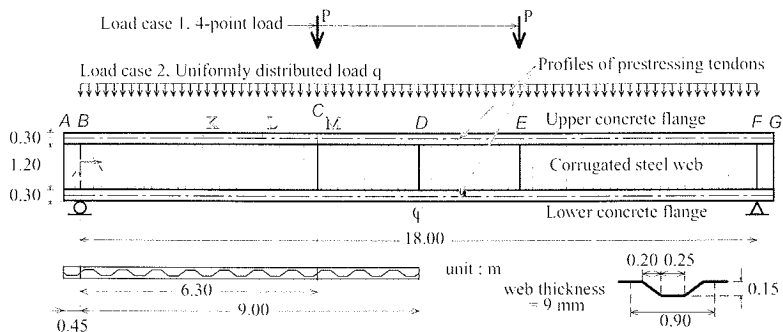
Simply supported girder under load case 1 and case 2, and its details.
